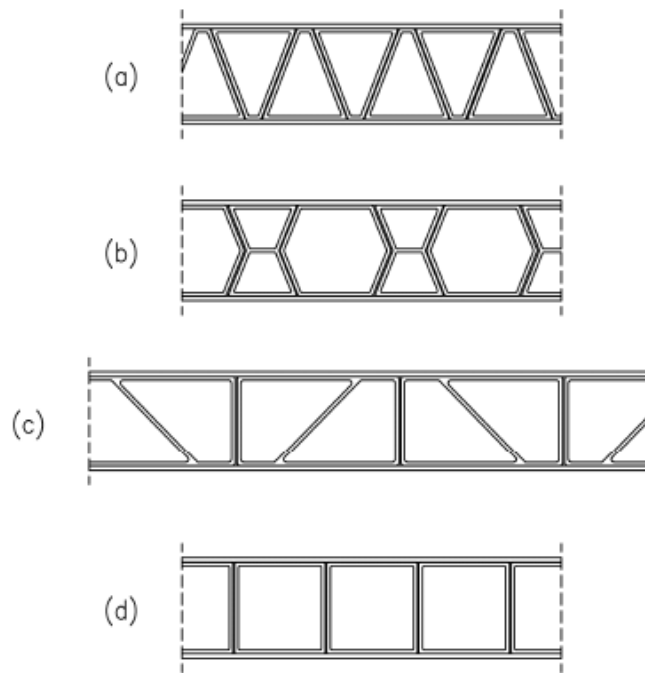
Examples of bridge decks made of adhesively bonded pultruded profiles: (a) EZ-Span, (b) Superdeck, (c) DuraSpan, (d) Strongwell FRP Deck System [4]
